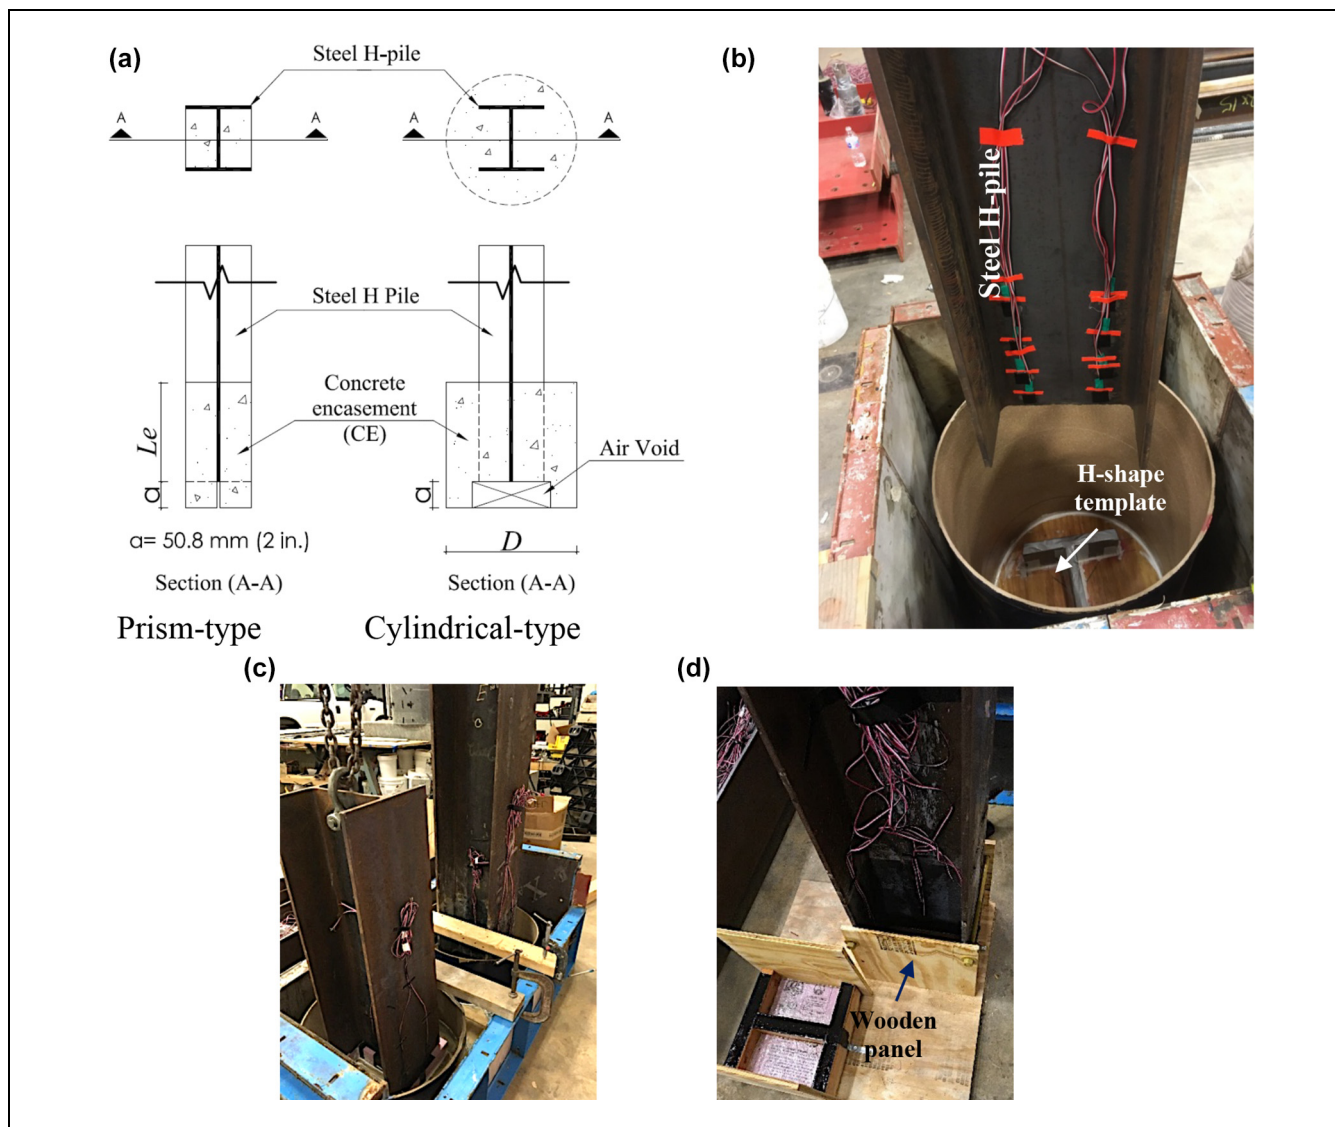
Specimen preparation: (a) layout, (b) placing the pile on the formed template, (c) pile placed inside the cardboard, and (d) pile placed inside a wooden box form.
